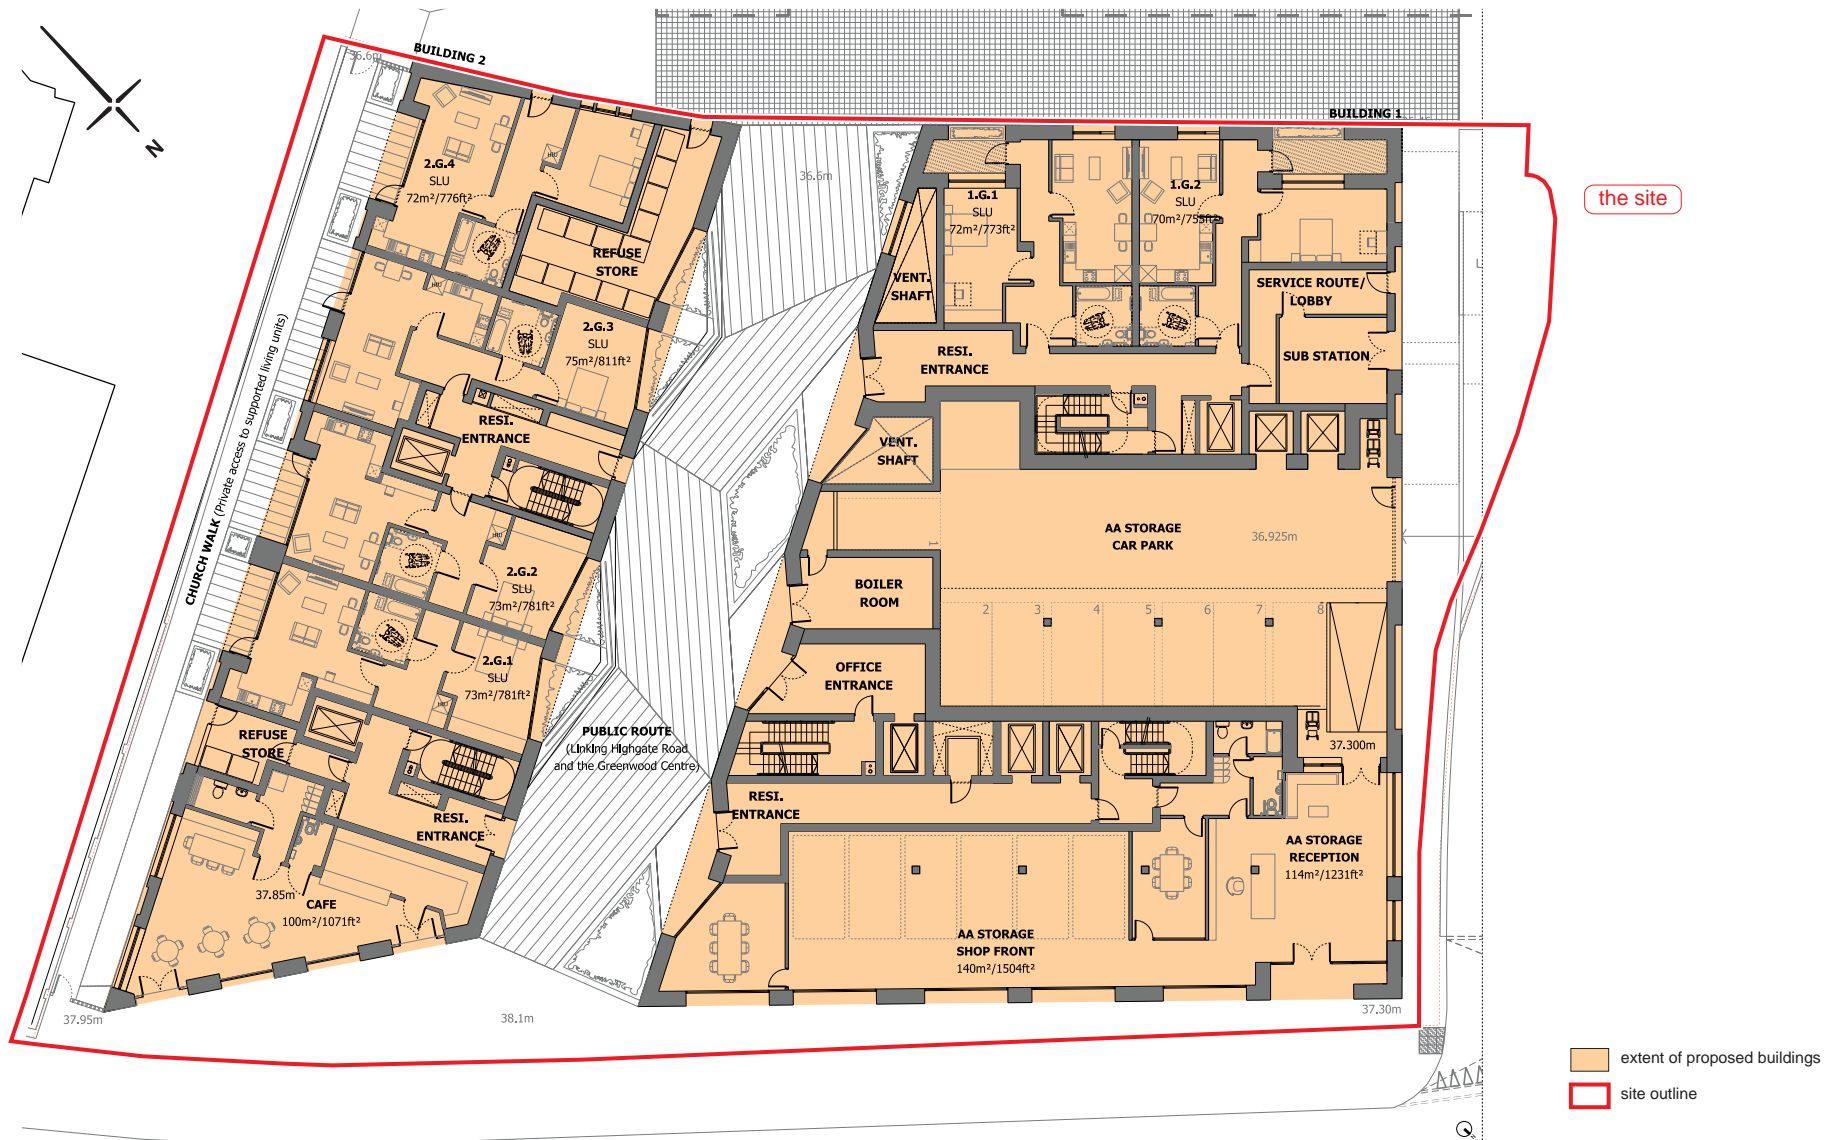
Proposed ground floor plan (Squire and Partners, dwg G100_B0_P_00_001, rev J, 04/02/16)
